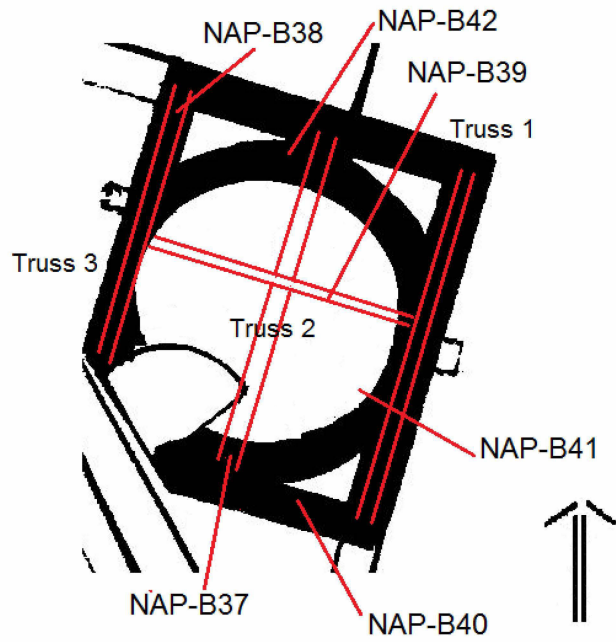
High-end tower, Turret roof, plan showing the location of samples NAP-B37–42 (John Warren)
